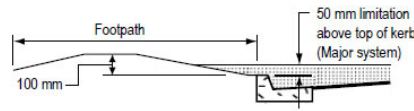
Cross section A-A adjacent to Point 3 and Point 4 (not to scale)
